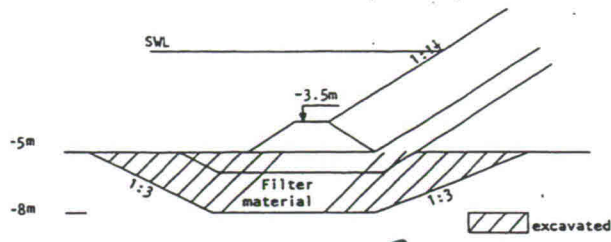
, Shallow water (5m) dredged trench gravel filter
